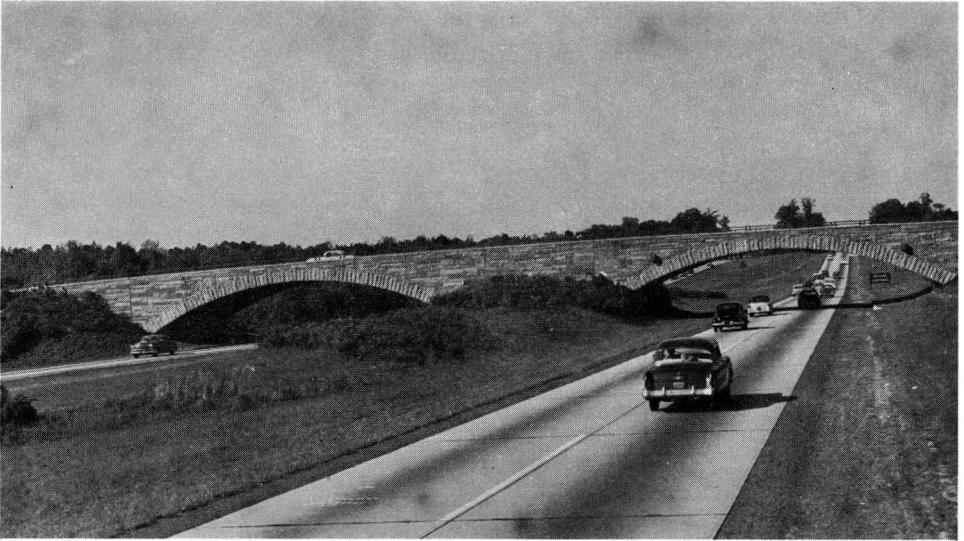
California, showing architectural treatment of structures. Median raised and planted as it approaches the overpass.
